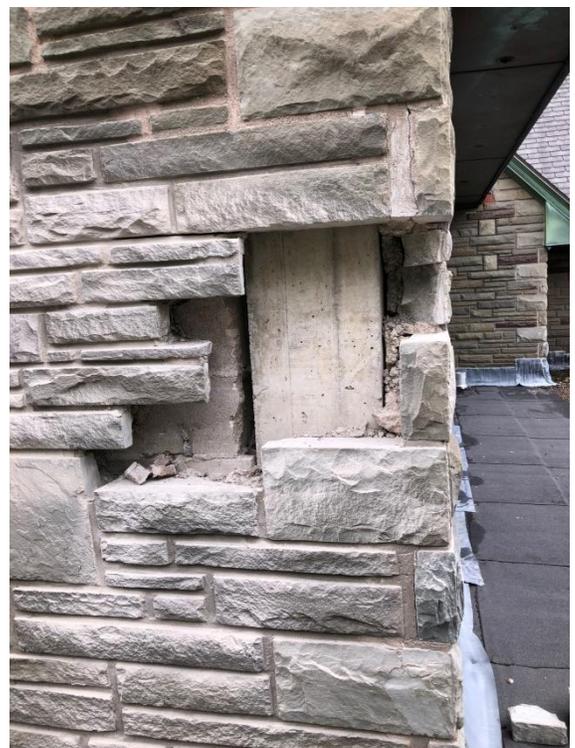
Opening 16 – Column at corner of wall. Dovetail slot present on block wall face of column. No dovetail ties observed.
